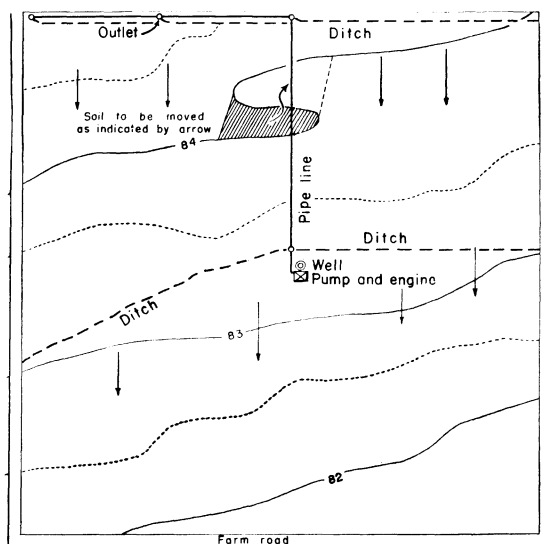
Plan of furrow irrigation for 10-acre tract.
